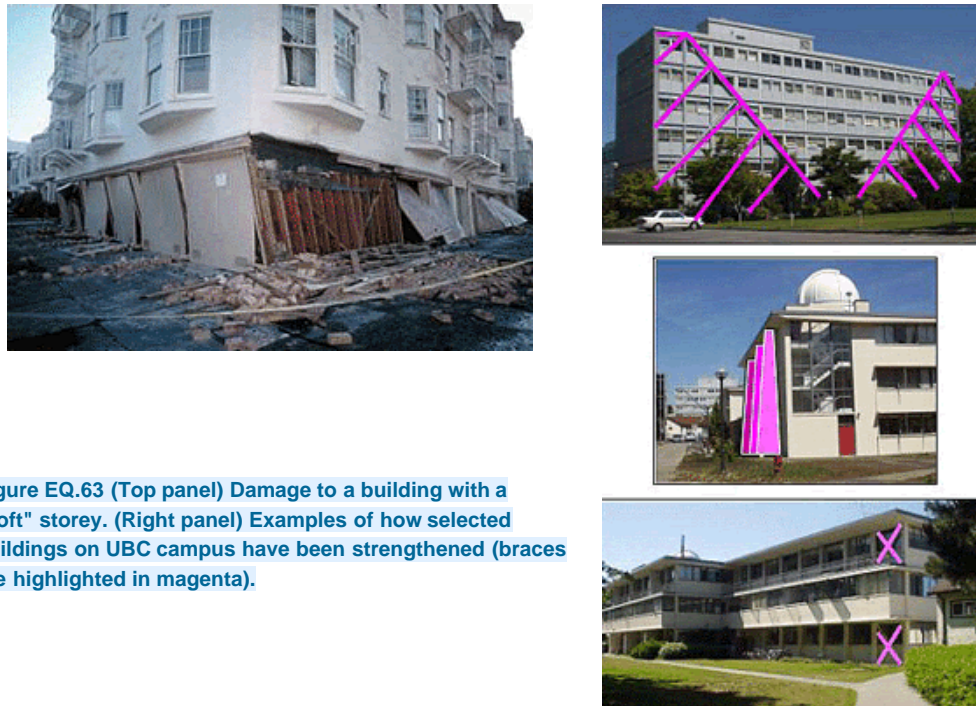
(Top panel) Damage to a building with a "soft" storey. (Right panel) Examples of how selected buildings on UBC campus have been strengthened (braces are highlighted in magenta).
